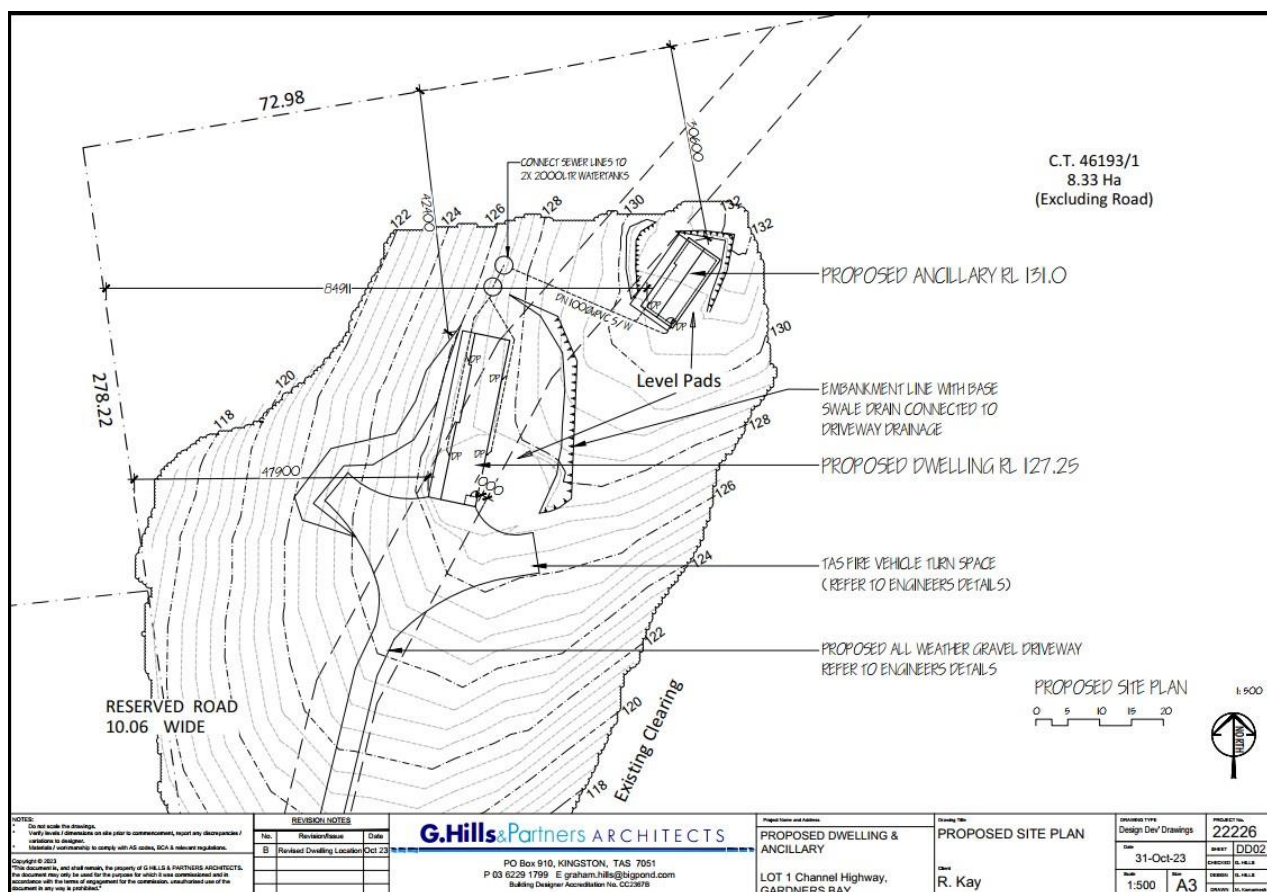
Site plan of proposed dwelling and ancillary unit located within cleared site. REF: G. Hills #22226.
